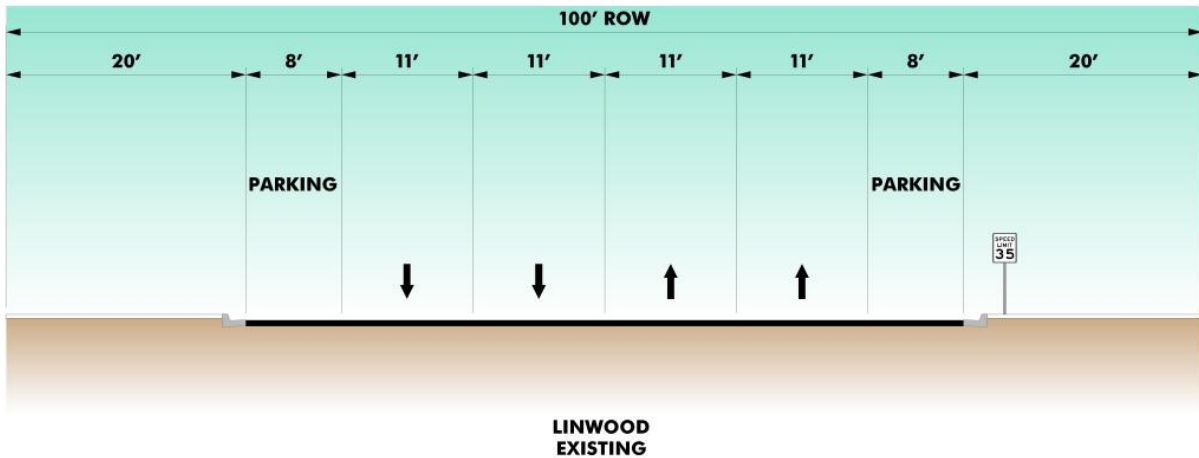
Enhanced Streetcar Linwood Blvd Typical Section, Existing Conditions
